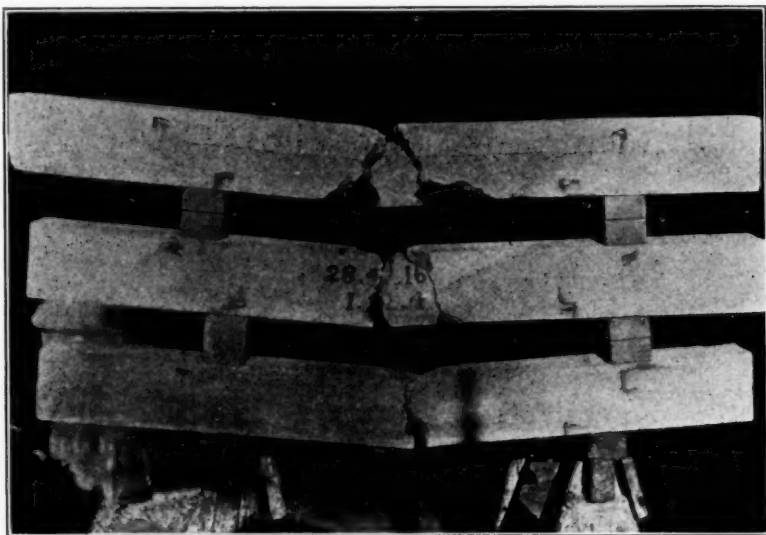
Typical Forms of Failure of Reinforced-Concrete Beams.
